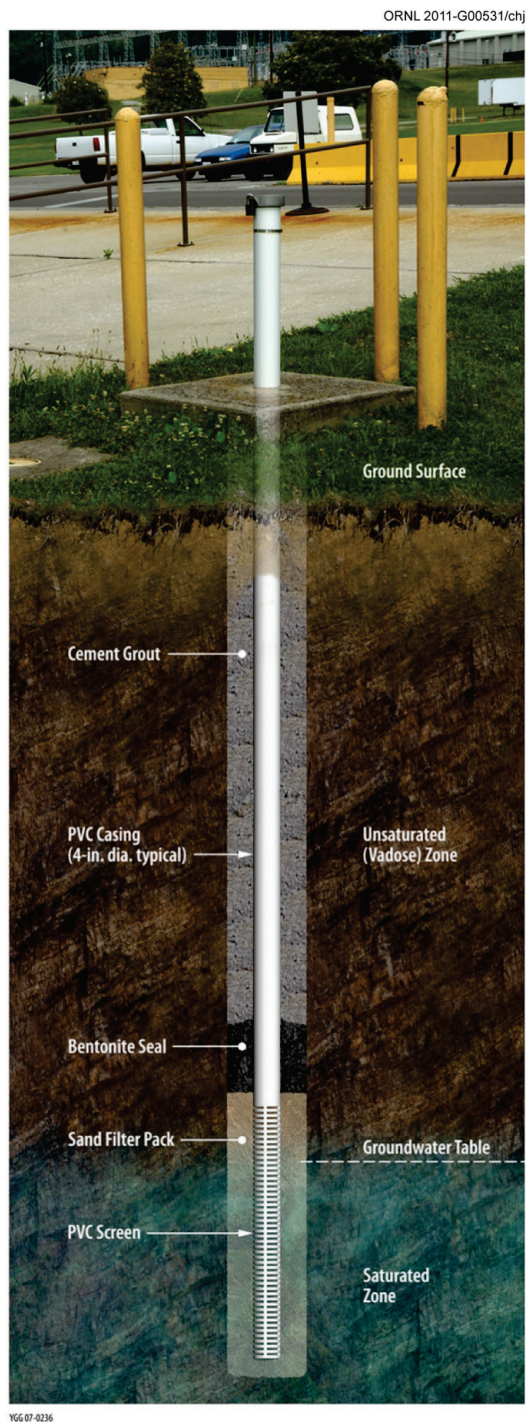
Cross section of a typical groundwater monitoring well.
